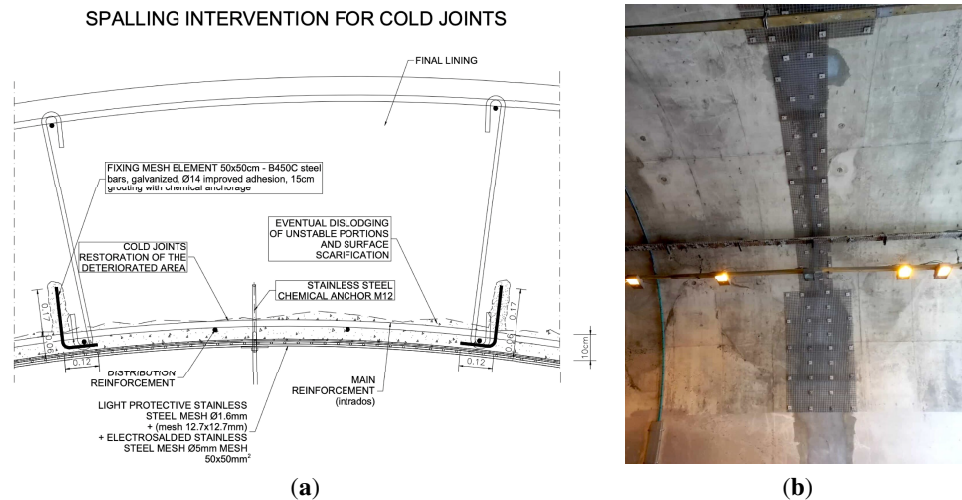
Repairing cold joints of tunnel linings: (a) Detail of the restoration works; (b) On site application of the repairing system.
